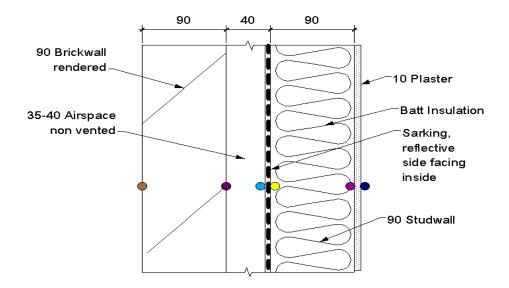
Section detail of the brick veneer wall at the test houses
